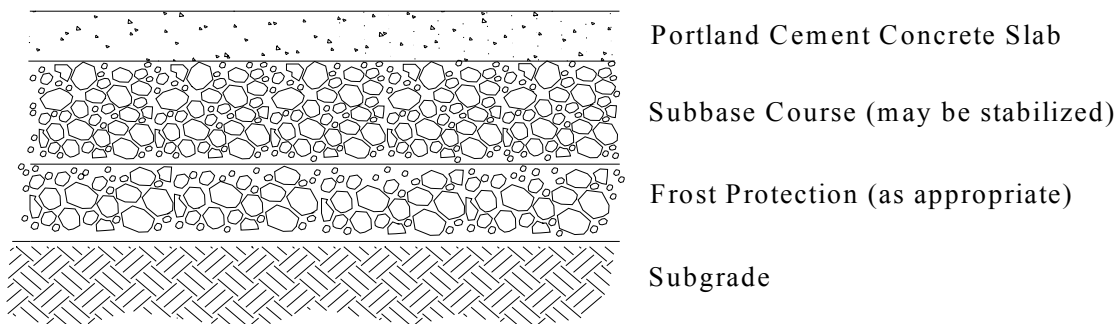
TYPICAL RIGID PAVEMENT STRUCTURE.
